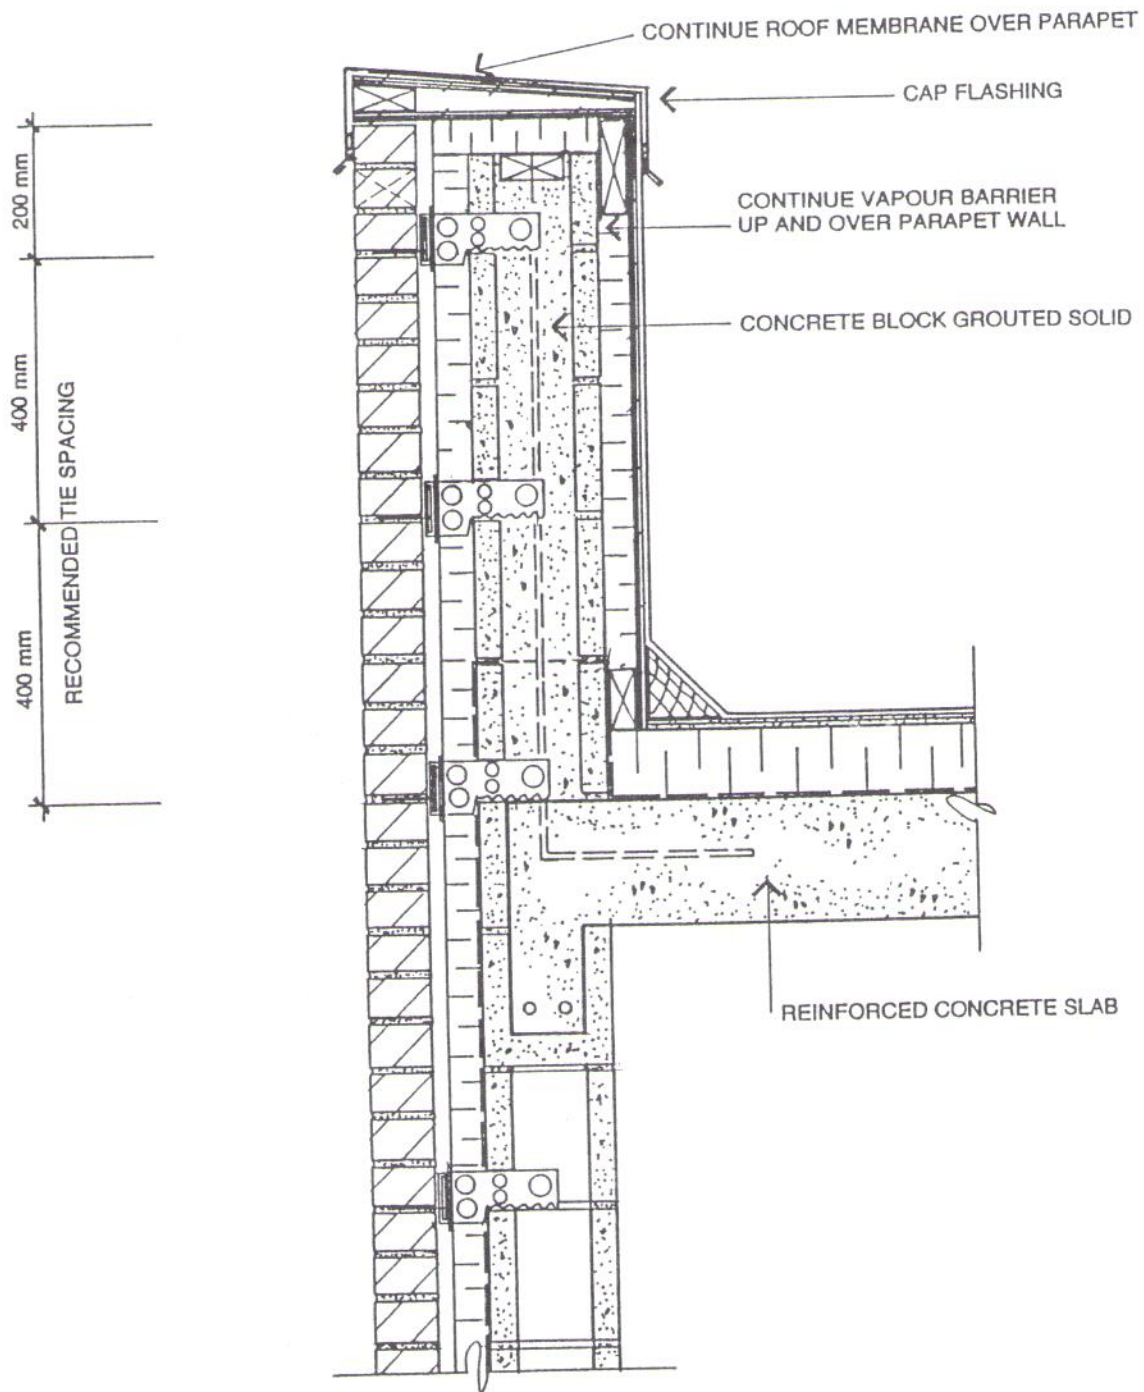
Brick Veneer/Concrete Block Detail At High Parapet
